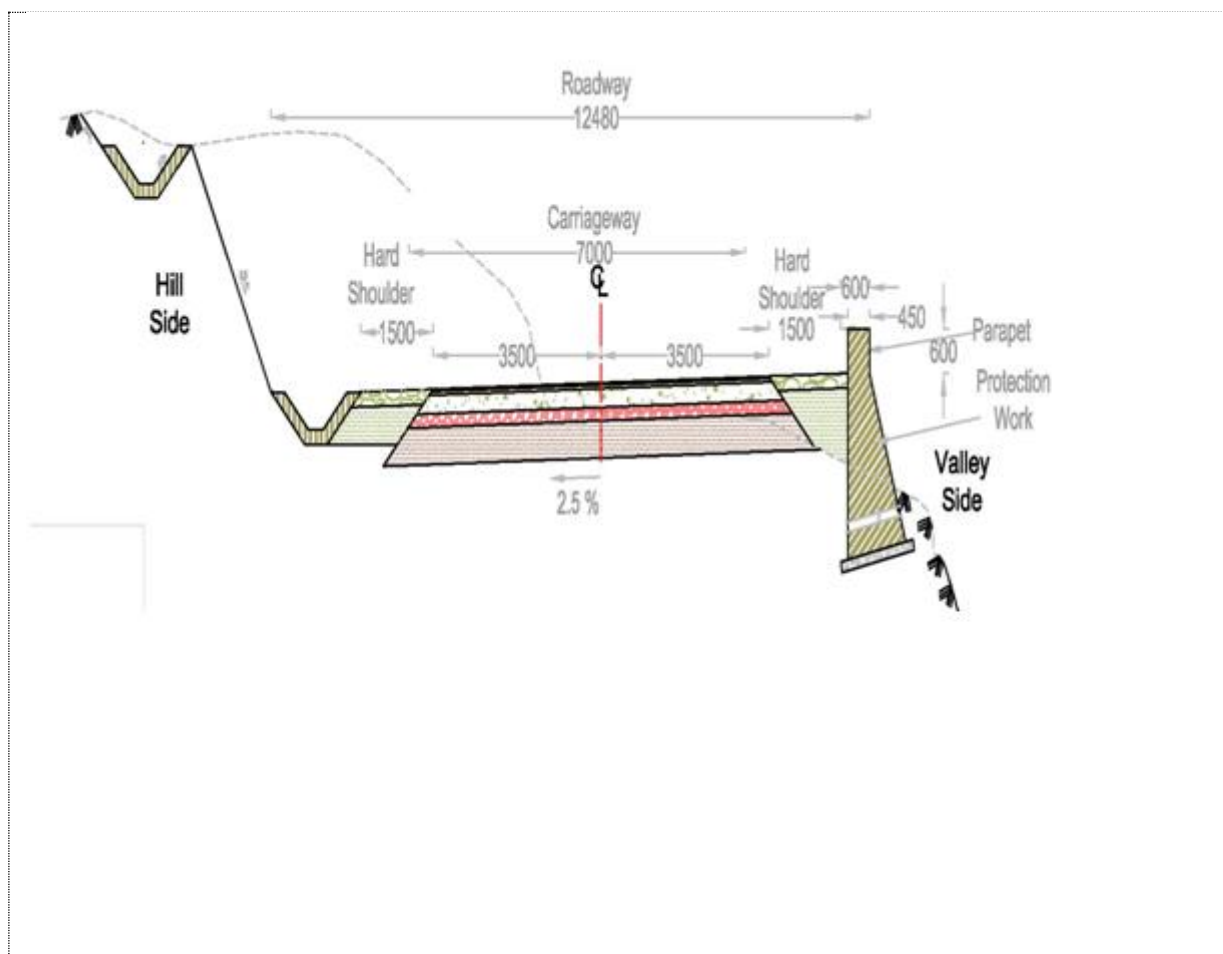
TCS for Project Road Sections requiring Fill on Valley Side TCS I(b)
